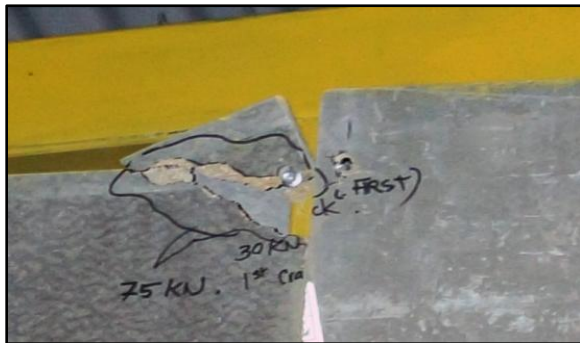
Pull out and Shear Failure of Screws–Frame (2)
